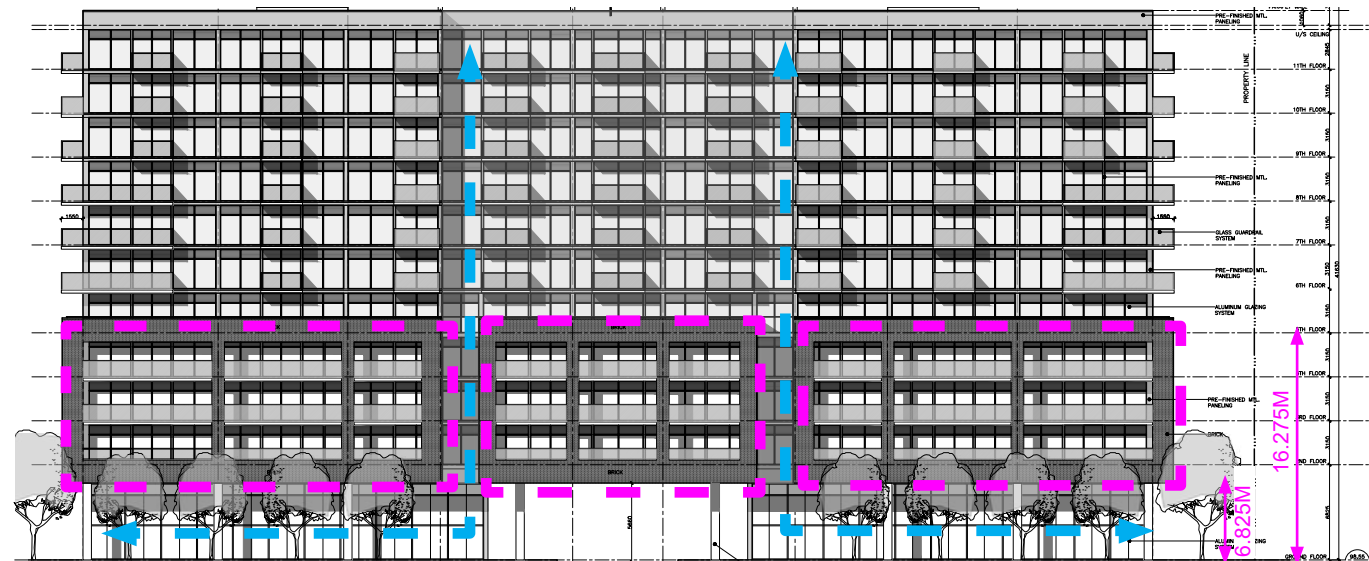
North Elevation Illustration Showing Three Vertical Bays and Continuity of Glass to the Street Wall
